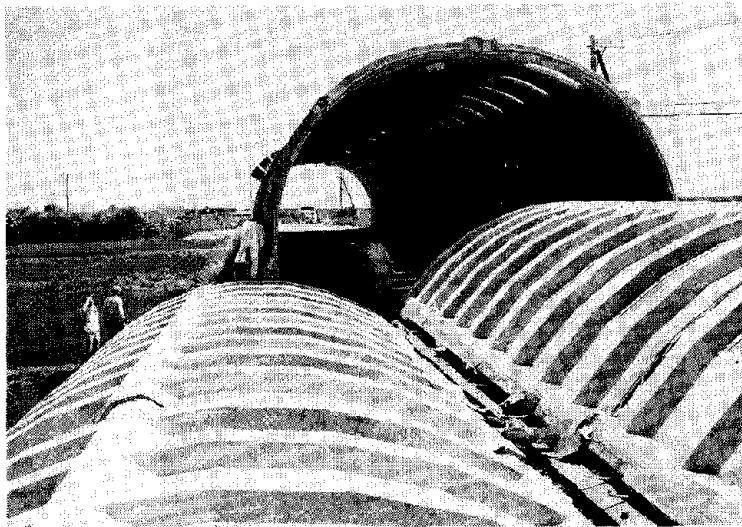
Collapse of A Snow Shelter (Okushiri Island)
